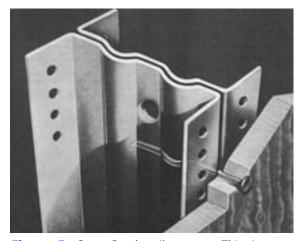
Stran-Steel nail groove. This innovation allowed the builder to install exterior and interior wall cladding by simply nailing it directly into the steel support structure. (*Great Lakes Steel Corporation, Stran-Steel Division*)
